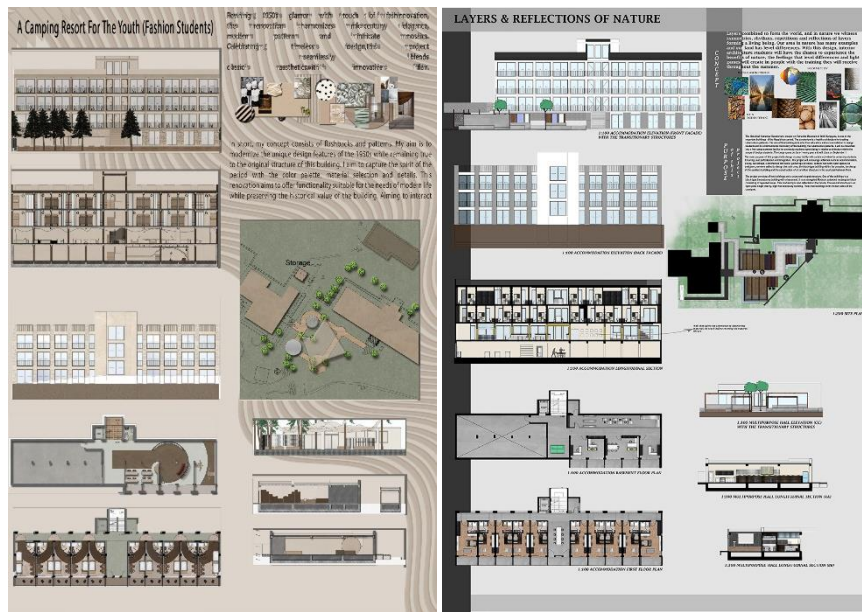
1:200 site plan and 1:100 plans and facades of the Fashinnovation (left) and Layer+reflection (right) projects (IAED, 2023)
